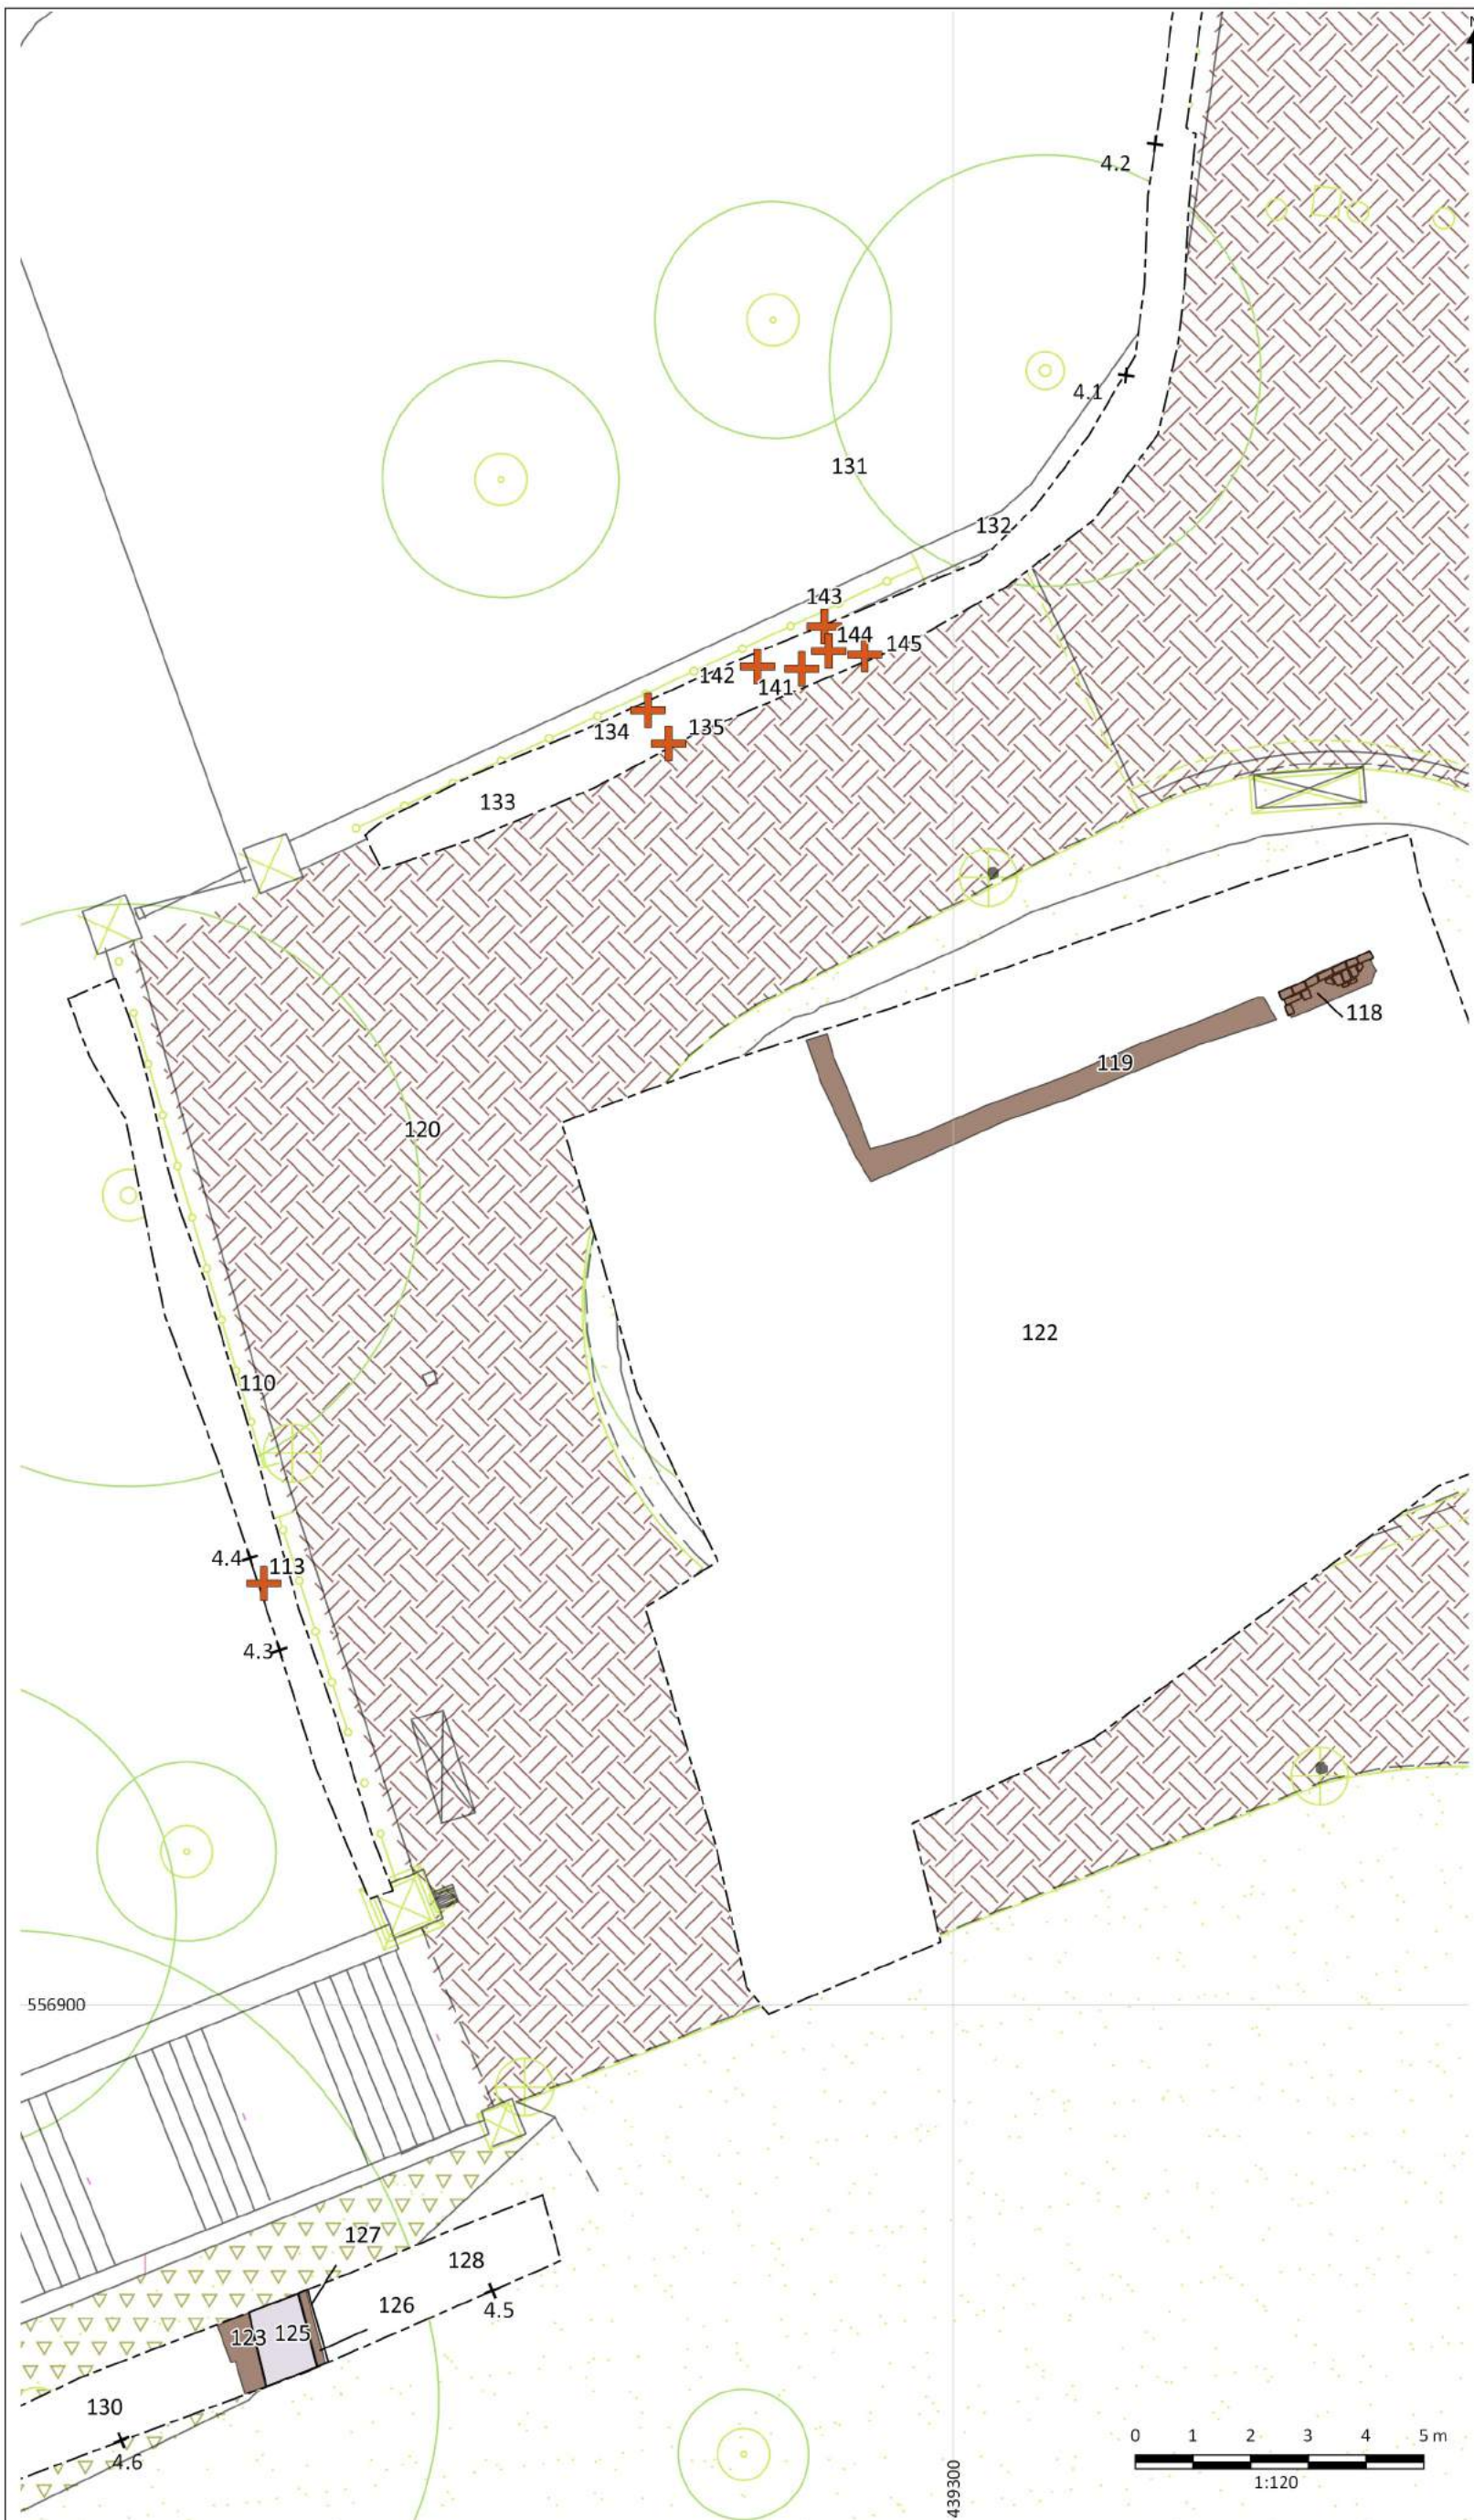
Site location plan showing scope of works (base plan provided by the client)
